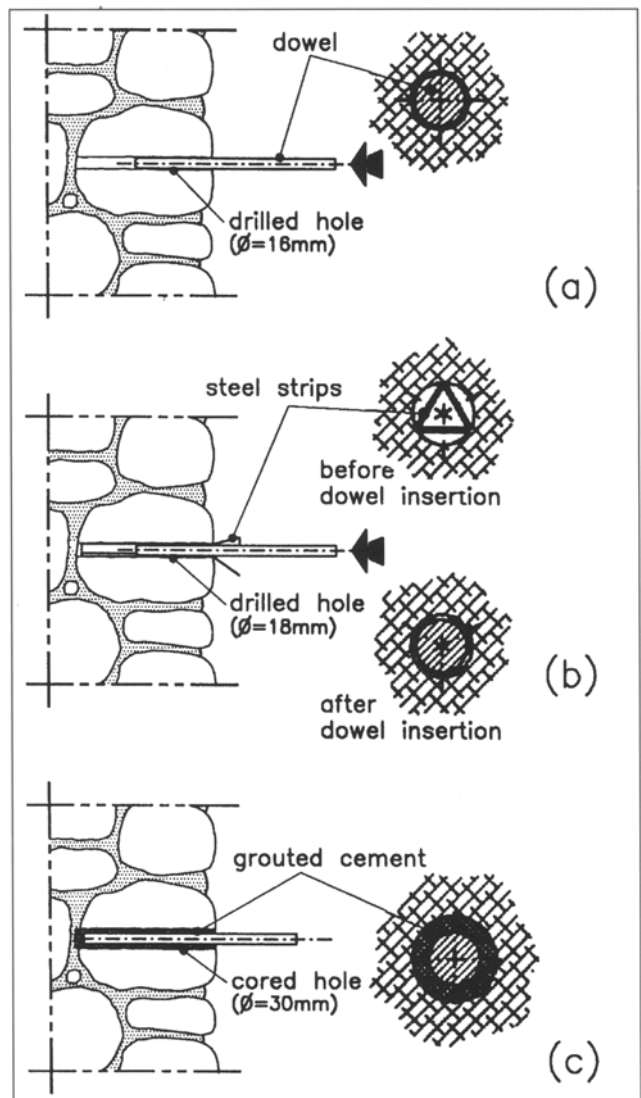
Dowel embedding techniques: a) rod forced in a calibrated hole (type A); b) rod forced in a hole interposing three steel strips (type B); c) rod embedded with cement grout (type C).
